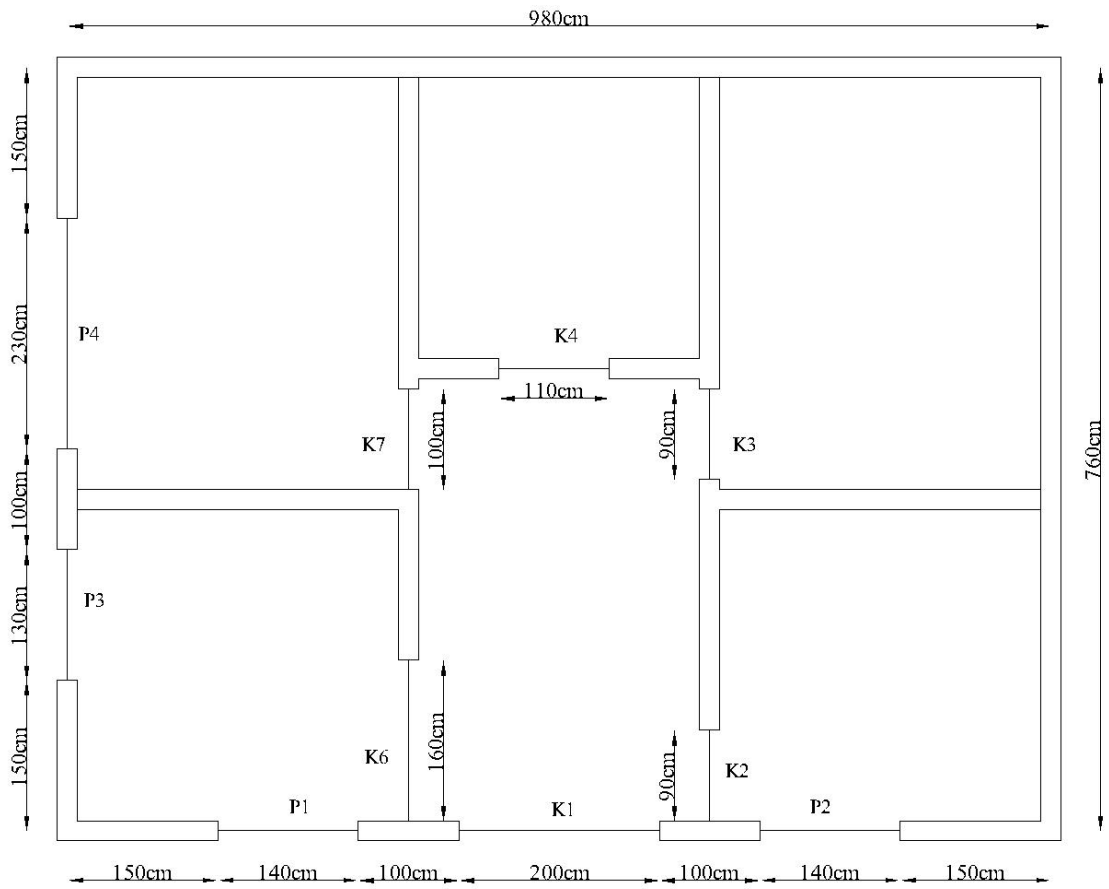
4. Plan geometry of the masonry building model of R2W1 subclass.
